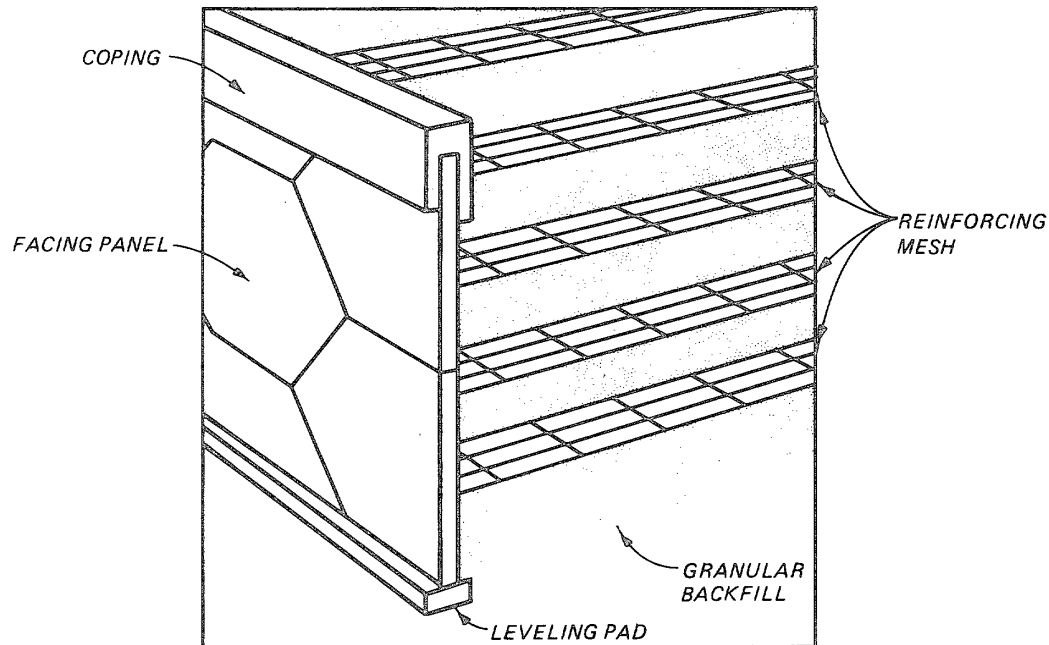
VSL retained earth retaining wall (adapted from VSL Corporation 1984)
